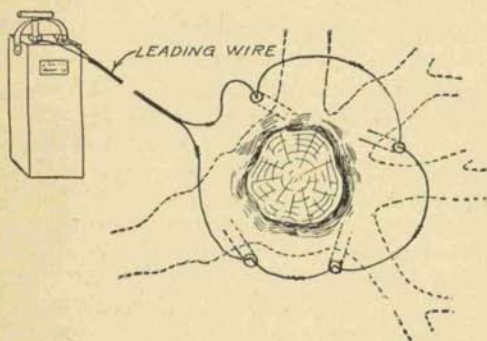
SHOWING FULL DETAILS OF LOADING DISTRIBUTED CHARGES, UNDER AND AROUND A LARGE STUMP FOR AN ELECTRICALLY-FIRED BLAST. THE LEADING WIRE SHOULD NOT BE LESS THAN 250 FEET LONG.
